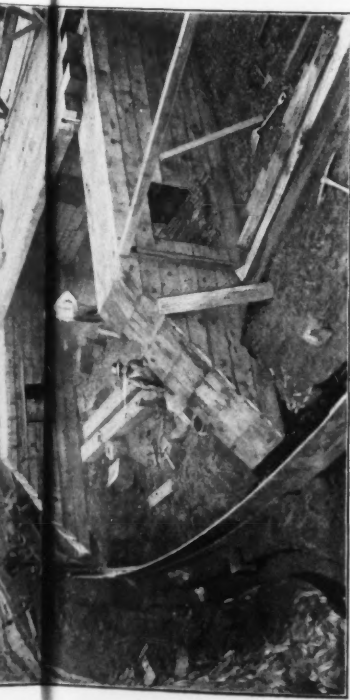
END OF TWO GIRDERS READY FOR SHEATHING AND INCLINED STAVES; ALSO SHOWS SHOE BEING ASSEMBLED.
